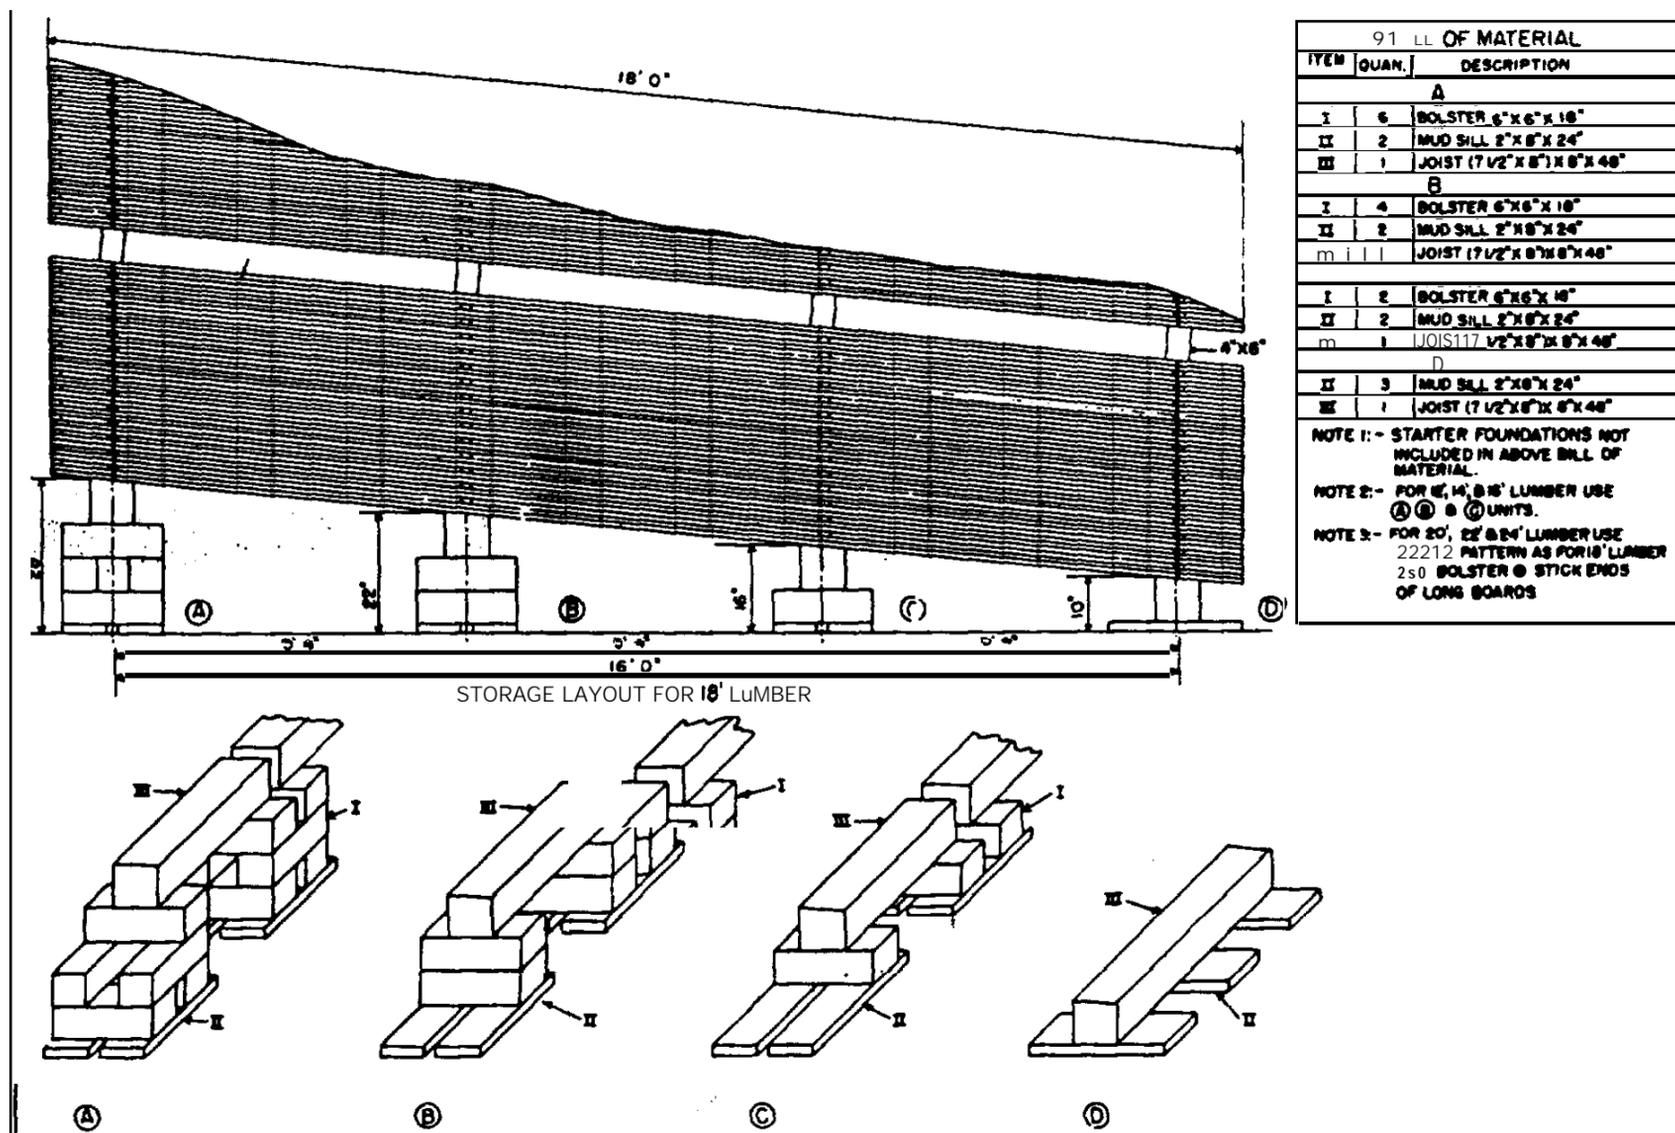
Diagram of properly stickered and formed drafts of lumber stored on wooden block foundation.
